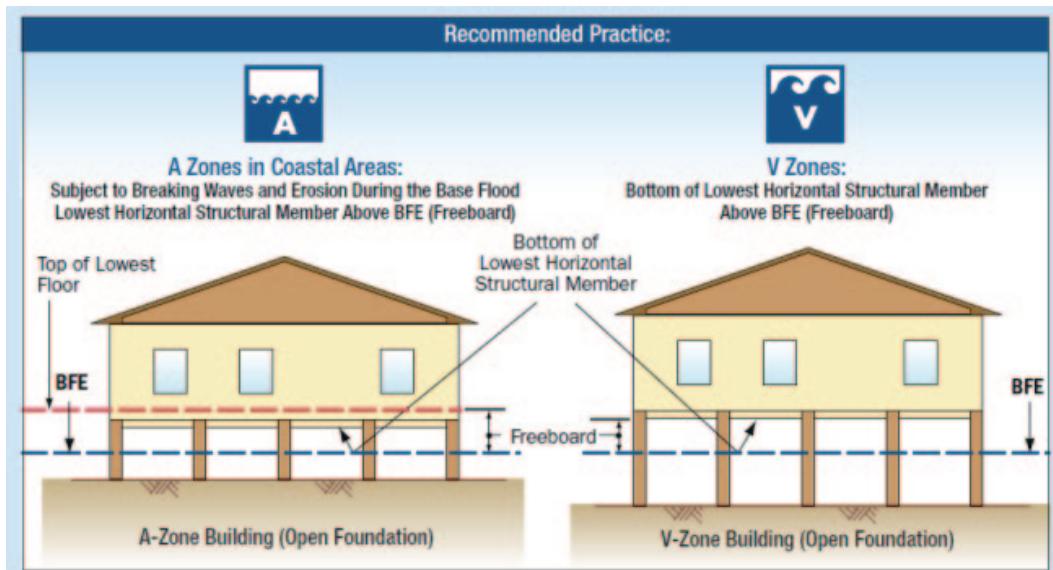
Recommended Building Elevations for Coastal Zone A and Zone V
